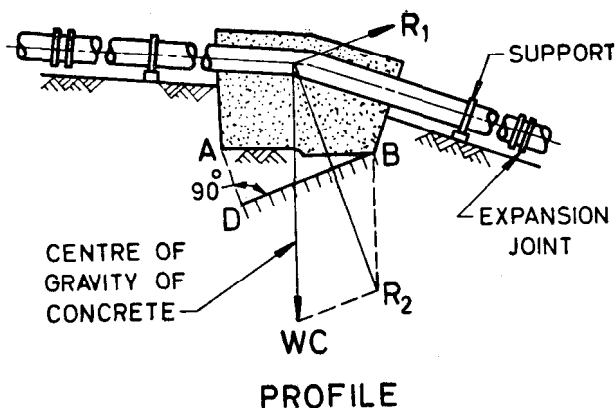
STABILITY OF ANCHOR BLOCK WITH STEPPED FOUNDATION
